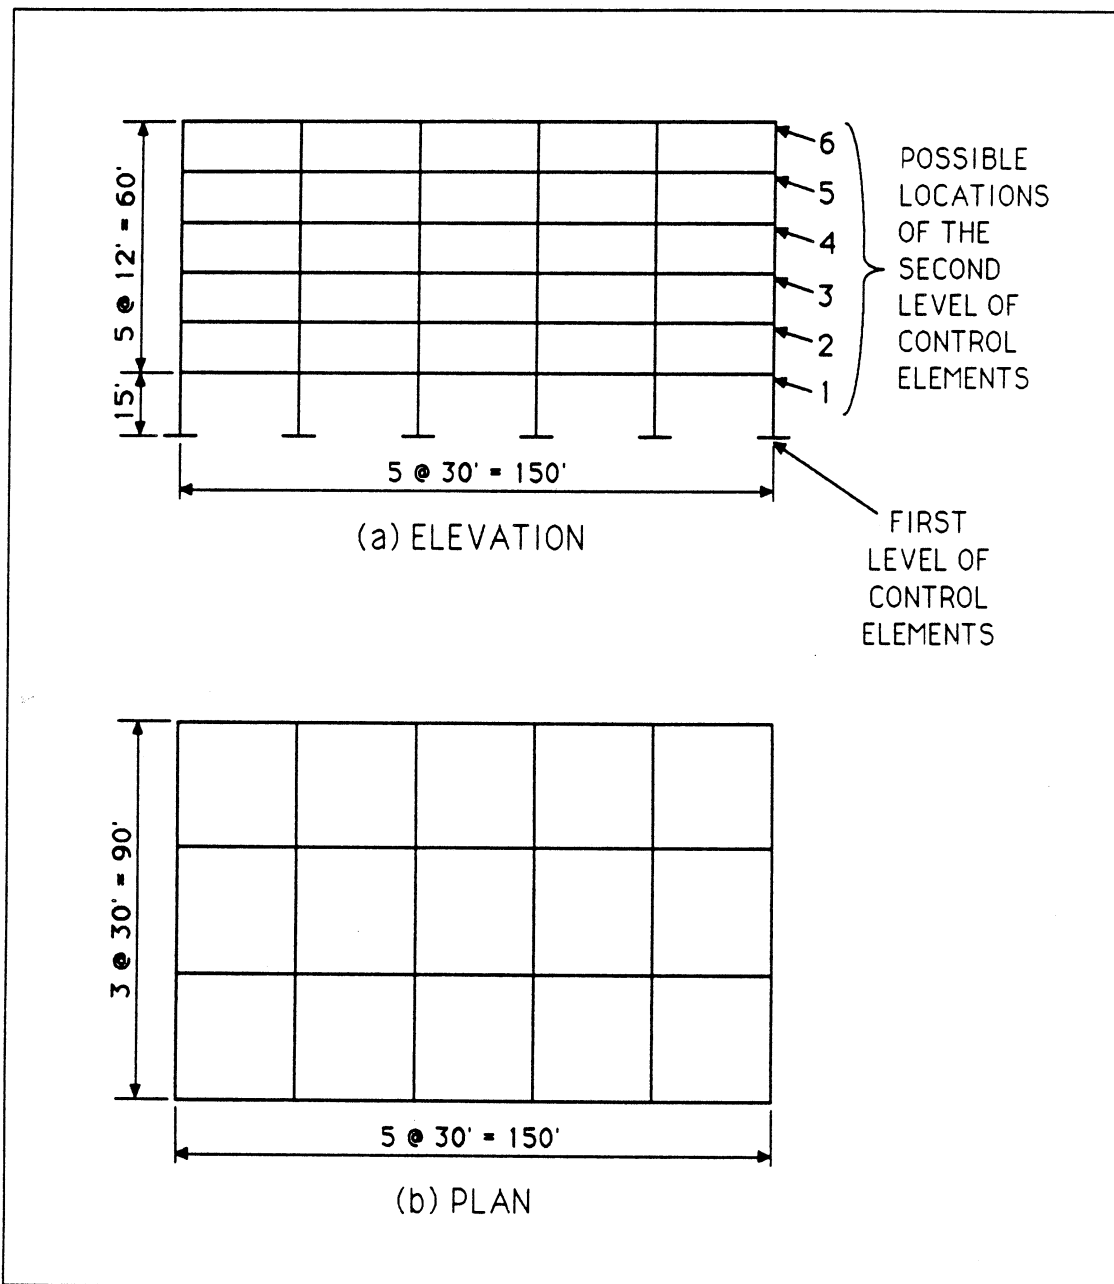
A six-story building example: a. Elevation; b. Plan
